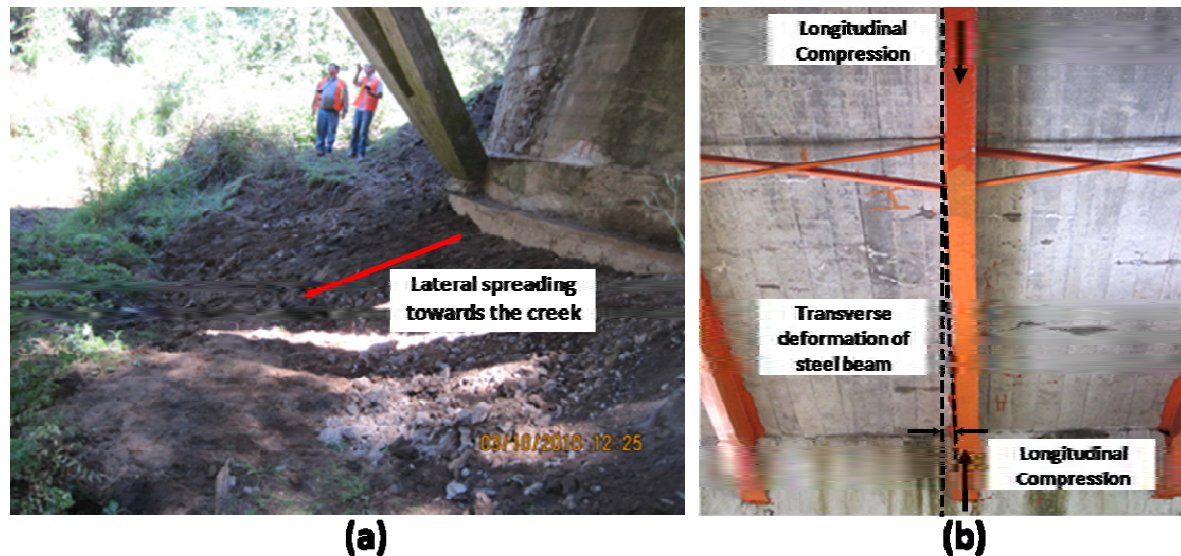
Pulen Bridge-(a)Evidence of lateral spreading at the north abutment (b) Loss of longitudinal alignment of steel I-beam (S37.112036, W72.986902, 1225 hrs on 3/10/2010)
